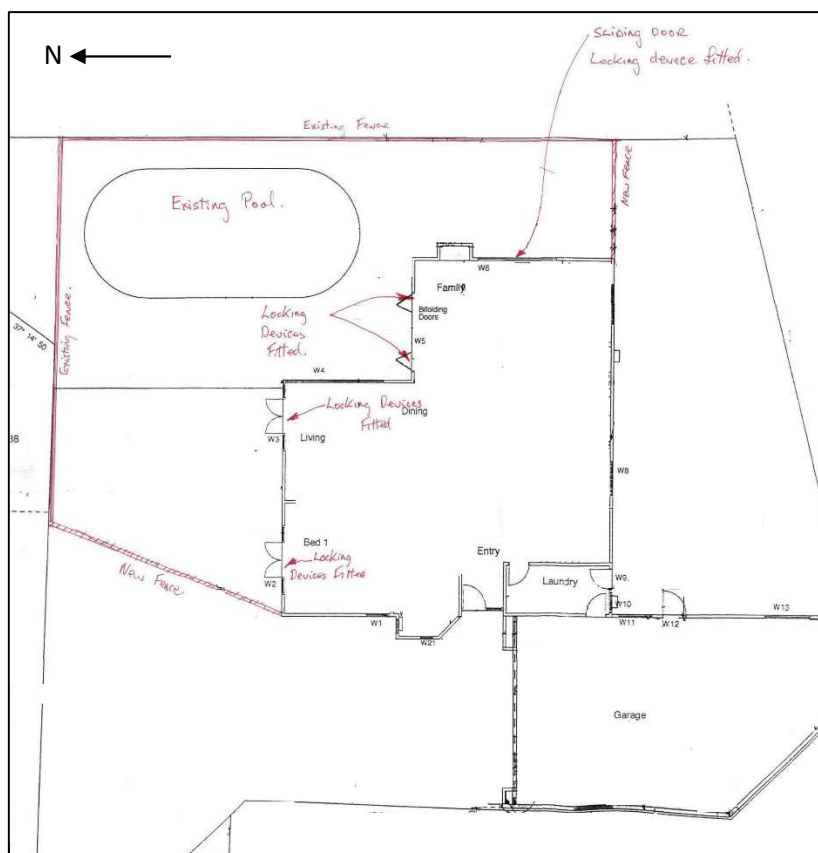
1997 site plan showing proposed fencing (not to scale)⁷
